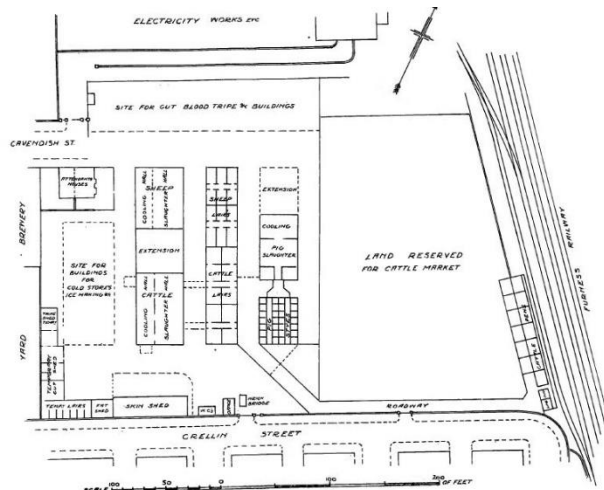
BARROW-IN-FURNESS. BLOCK PLAN.
